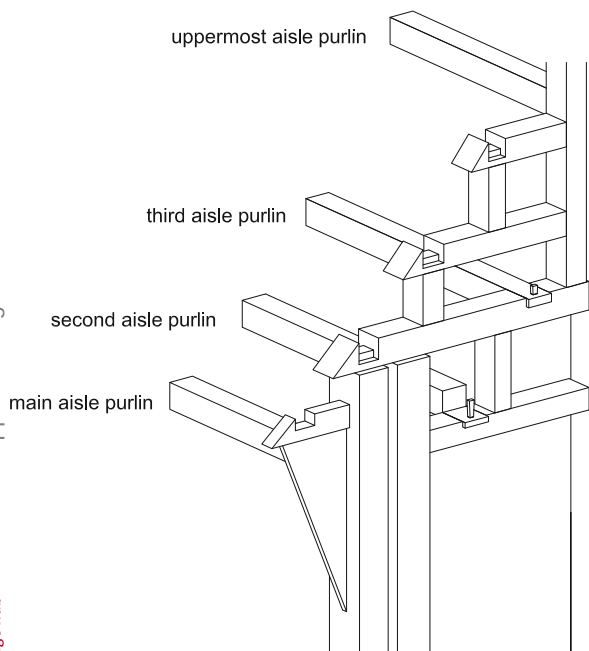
Purlins from the first bay meeting the second transverse frame in aisle roof
